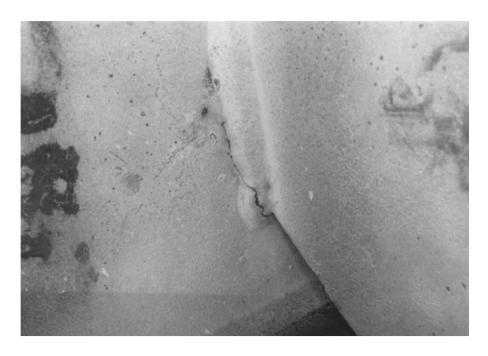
Web Gap Cracking at End of Transverse Connection Plate
